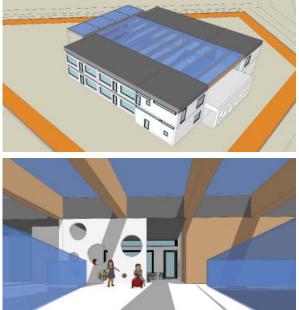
FIRST PROPOSAL OF ROOF FORM.
